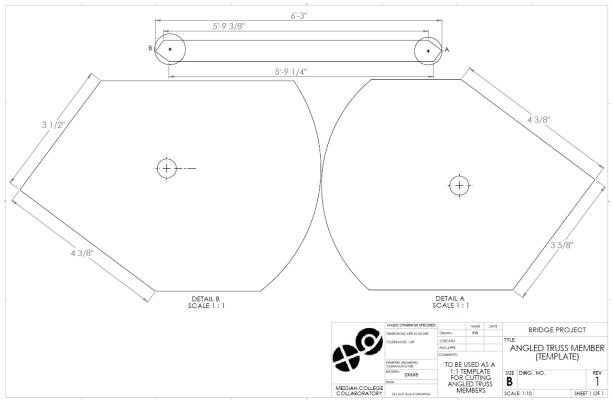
Sample of the shop drawings (details for each member) developed as part of the bridge design.
